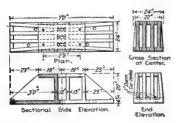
STEEL COLUMN SECTIONS AND CAST IRON COLUMN BASES. AMERICAN BRIDGE COMPANY.
